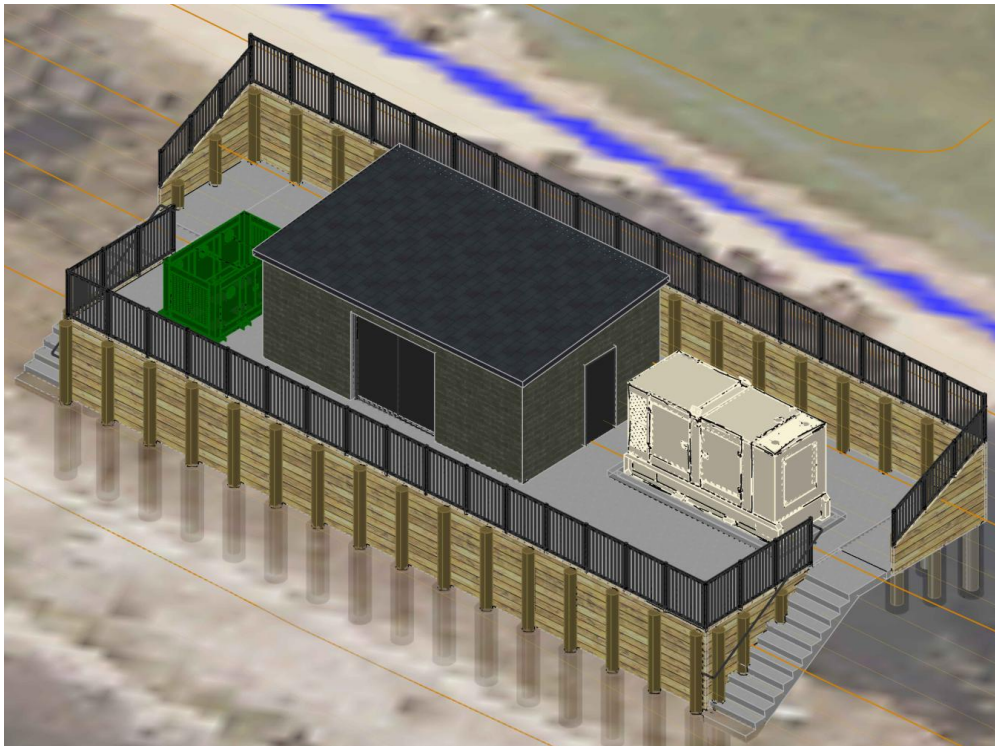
General depiction of the borefield electrical switchboard and communications or Motor Control Centre building (MCC building)
